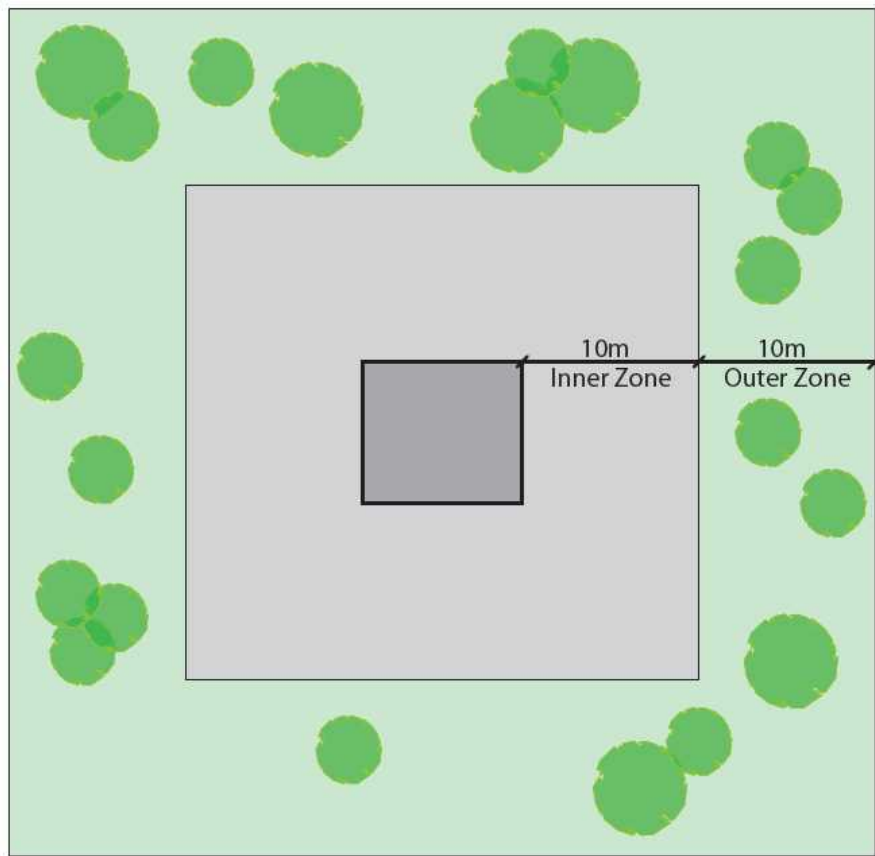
Fuel reduction zones for class 10 buildings
